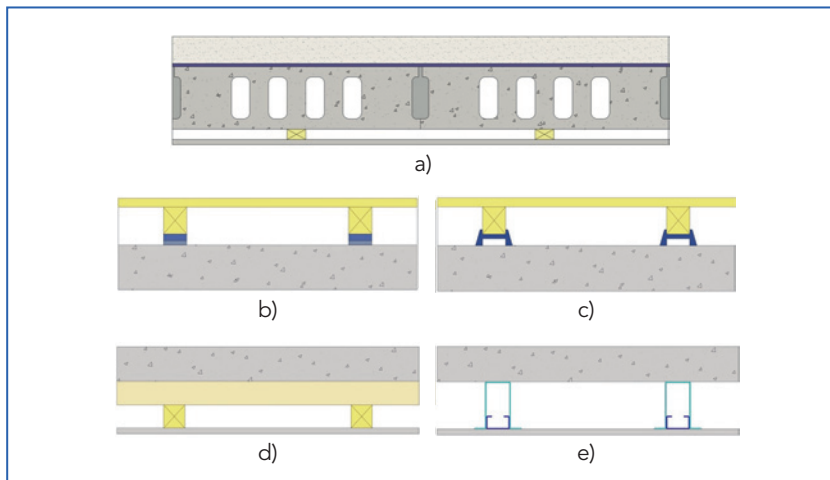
Examples of precast concrete separating floors [3] used in the UK with a) screed finish on isolating layer; b) use of resilient flooring battens; c) use of resilient cradle floor deck systems; d) Timber counter strapped ceiling frames; e) metal frame ceilings. (Note: primary resilient zones shown in dark blue).
